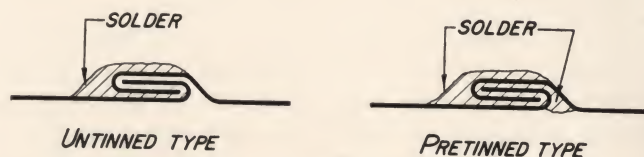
SOLDERED FLAT-LOCK SEAMS
